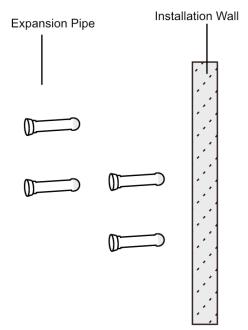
Open A Hole And Embed the Expansion Pipe
